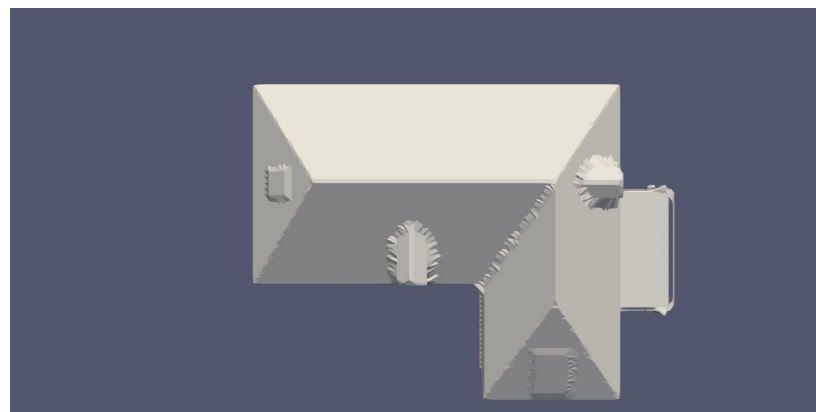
Extracted building envelope of the BIMcollab STR model
